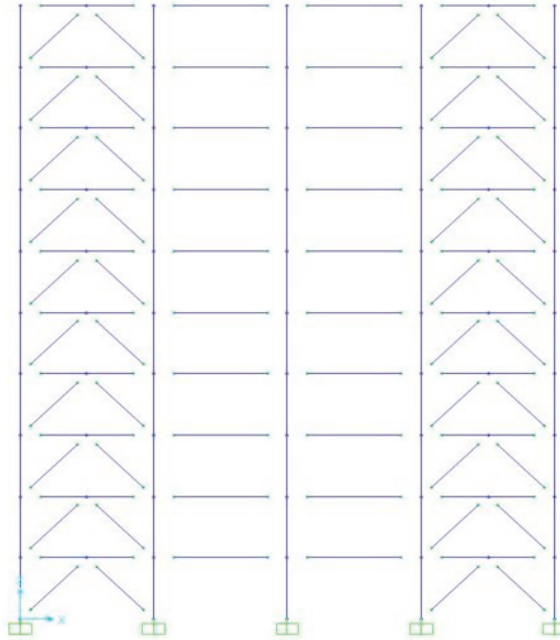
Schematic View of Concentrically Braced Frame with Assigned Frame Members.
